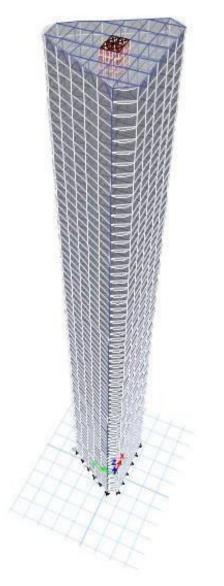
3 – Dimensional view with slabs, columns & beams (70 storey)
